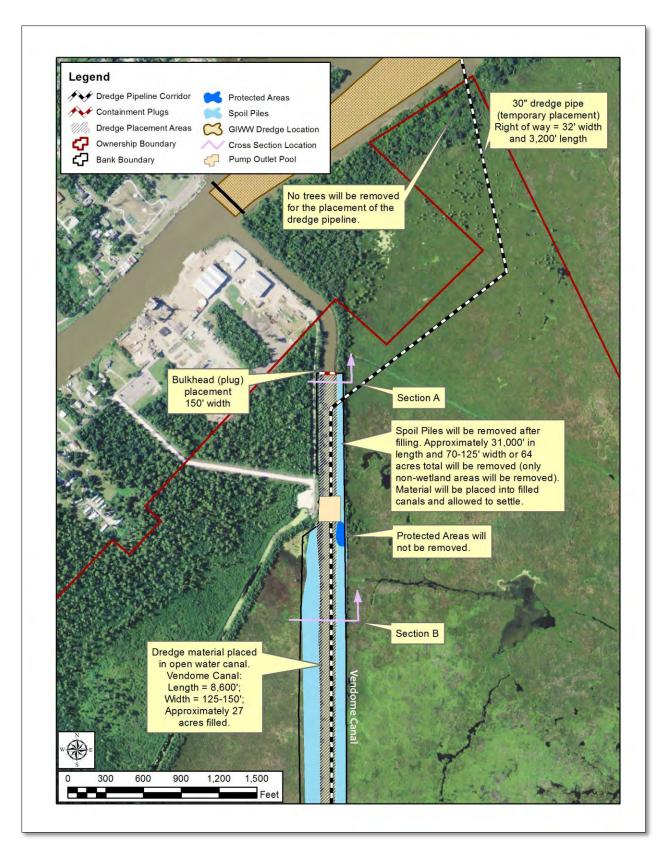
Dredge Placement, Pipe Location, Cross Section Locations, and Spoil Piles.
